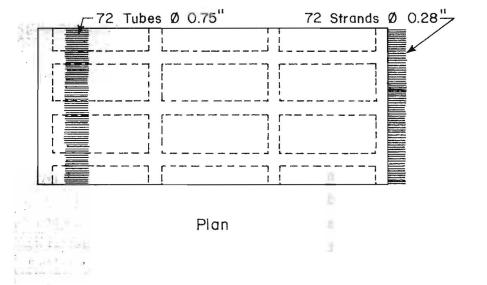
PRETENSIONING ABUTMENT FOR PRESTRESSED PAVEMENT AT HAARLEMMERMEER, NETHERLANDS
